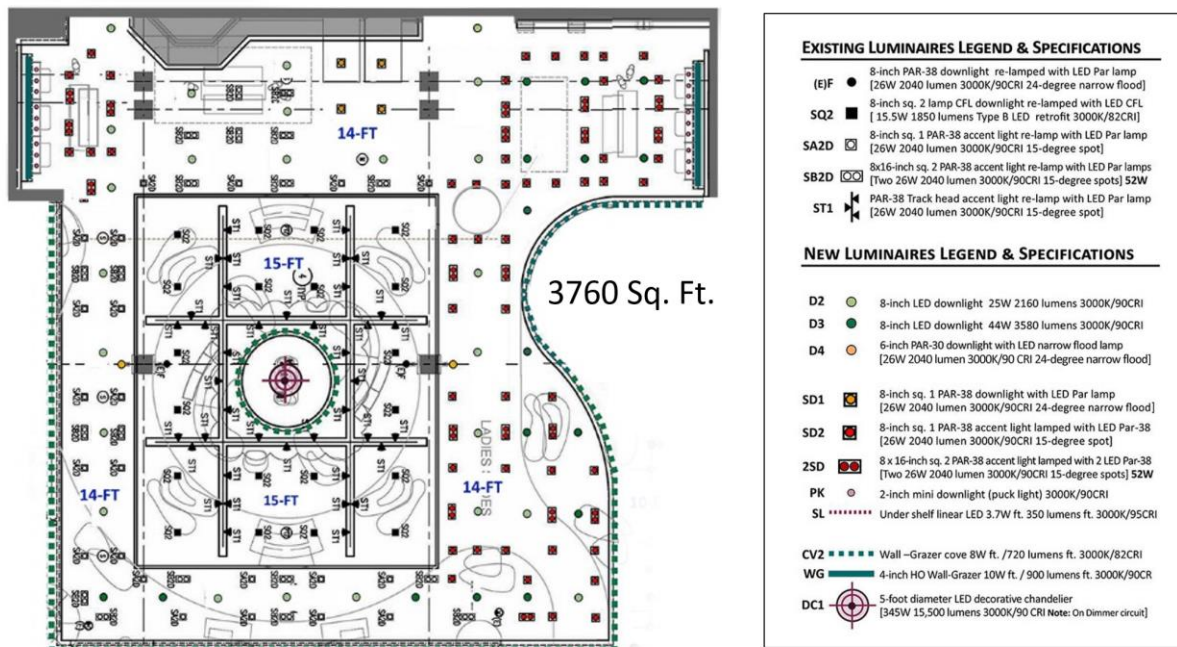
Reflected ceiling plan high ceiling women’s shoes.
